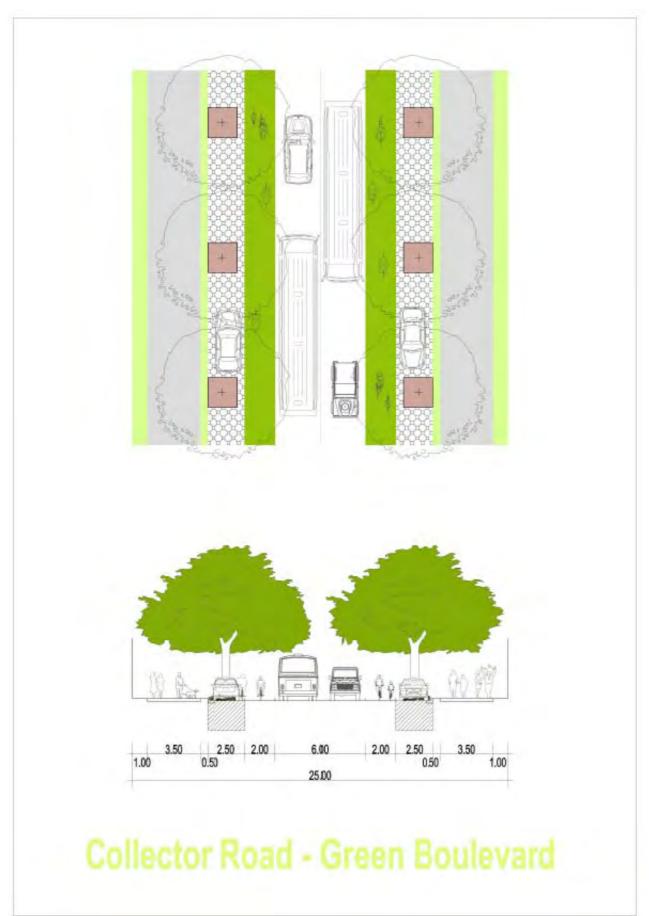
Collector Road (Green Boulevard) Typical Cross Section
